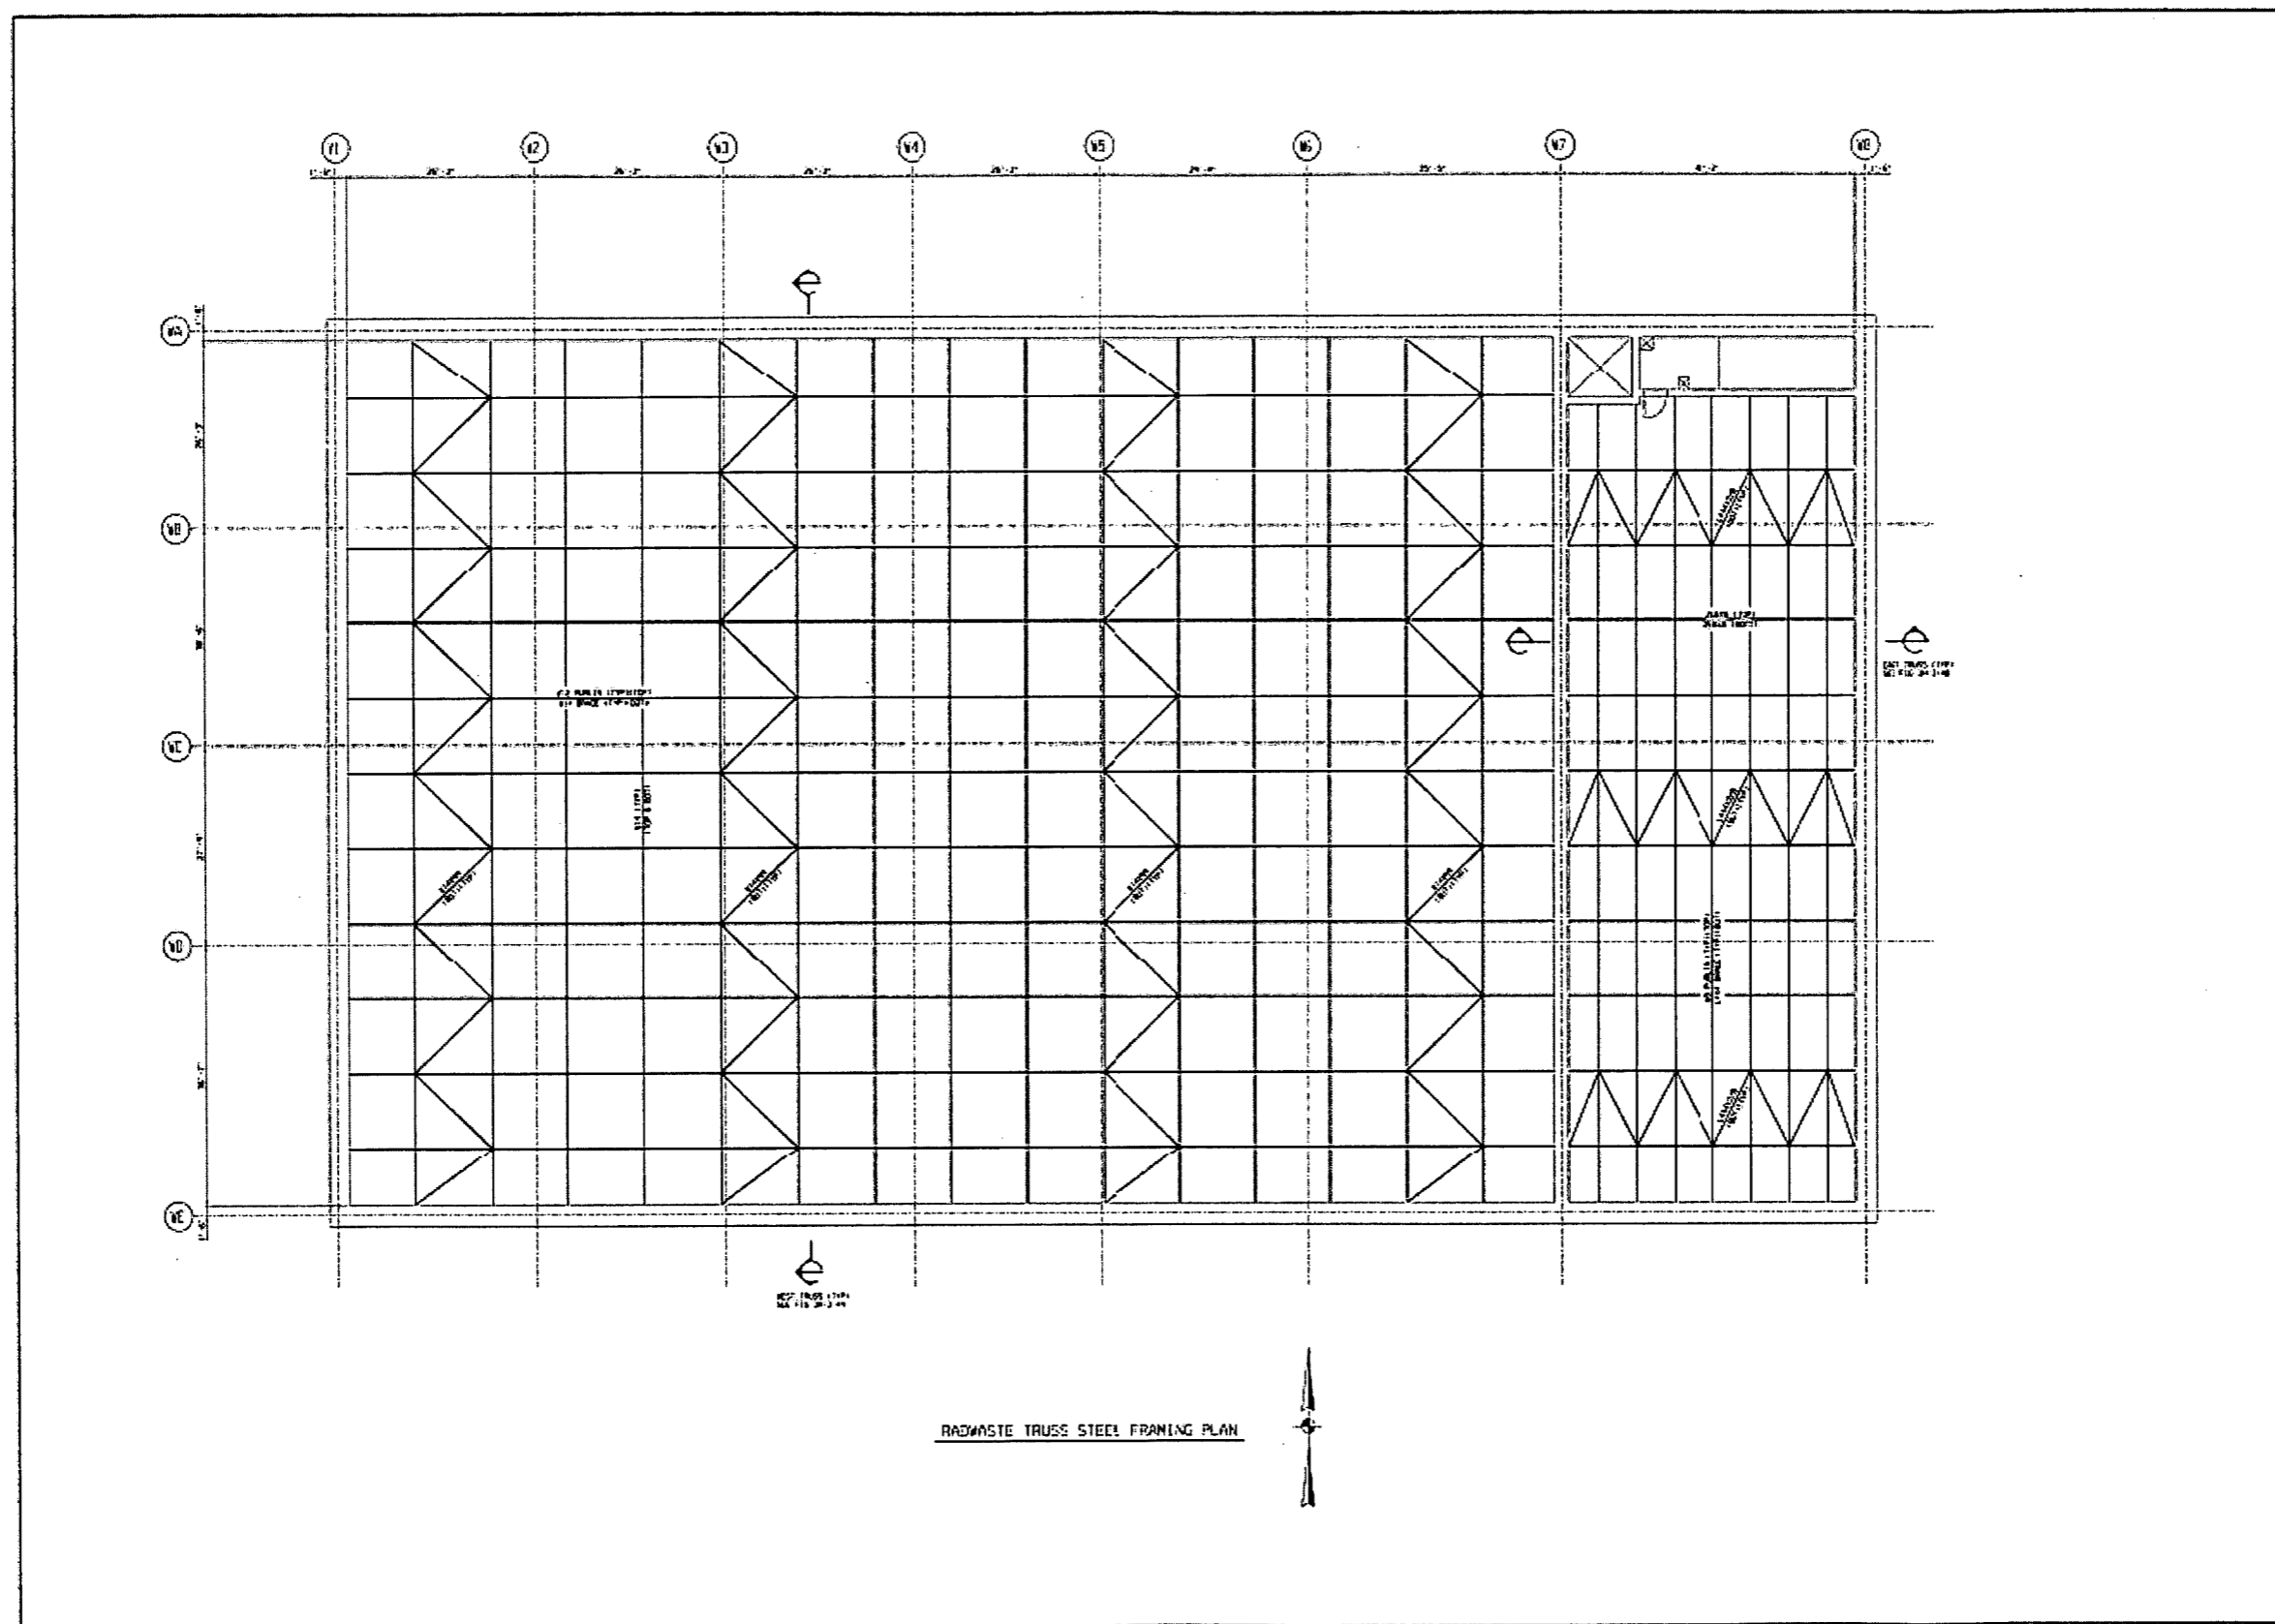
ROOF TRUSS, PURLIN AND HORIZONTAL BRACING LAYOUT (PLAN VIEW)
